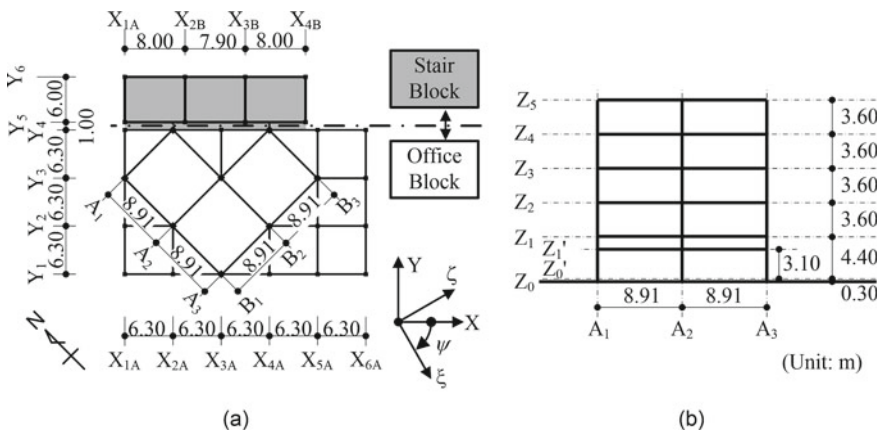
Simplified structural plan and elevation of the main building of the former Uto City Hall. a Structural plan (level Z_0), b Simplified structural elevation (frame B_1)
